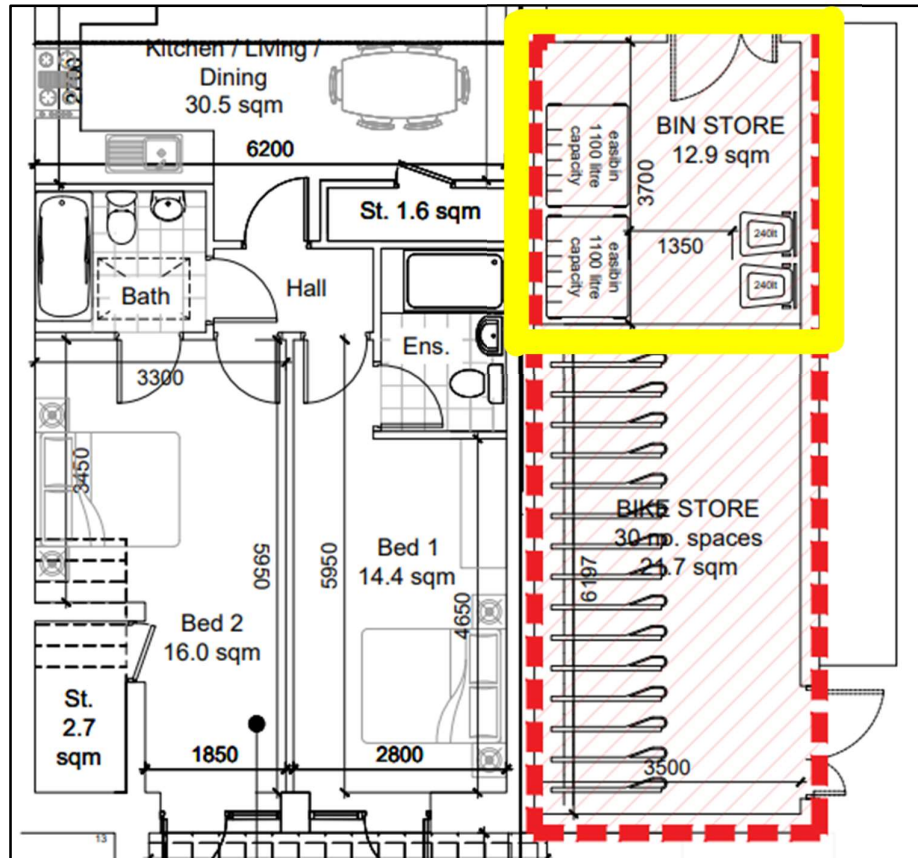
Location and internal layout of Waste Storage Area for Duplex Block B3 (Yellow) (MCORM, 2025)
